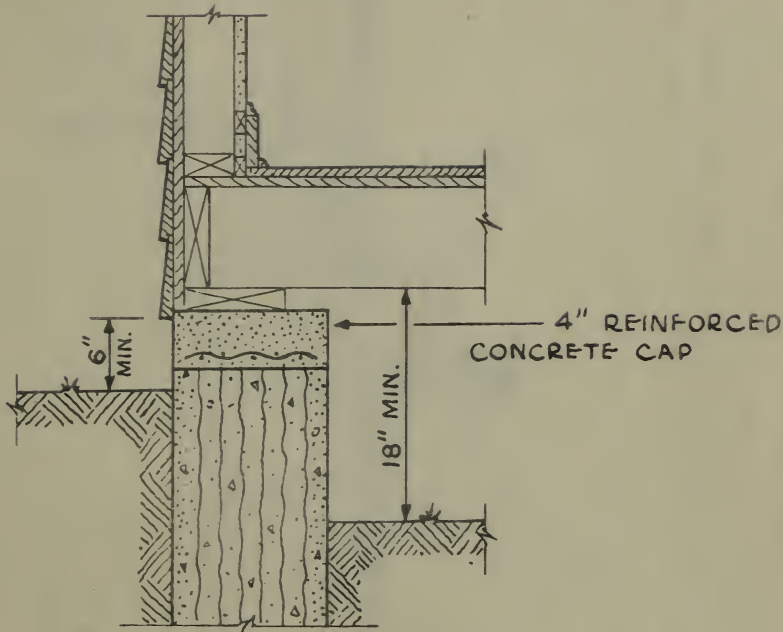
A REINFORCED POURED CONCRETE CAP on masonry walls or piers will prevent hidden attack by termites. This cap should be at least 4 inches thick and must be poured in one continuous operation so as to avoid joints. Minimum clearance of 18 inches under the building and 6 inches outside will allow inspection for the presence of termite tubes or for possible cracking of the cap.
